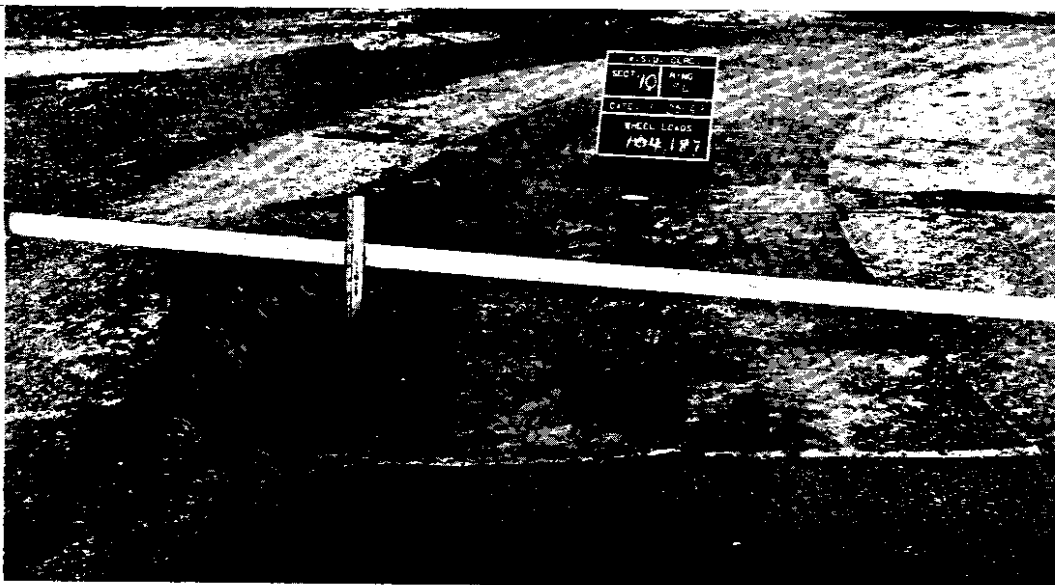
"ULTIMATE FAILURE" IN HALF OF SECTION 10 AT 104,187 WHEEL LOADS. THIS PART WAS REMOVED AND THE OTHER HALF OF THE SECTION WAS LEFT.
